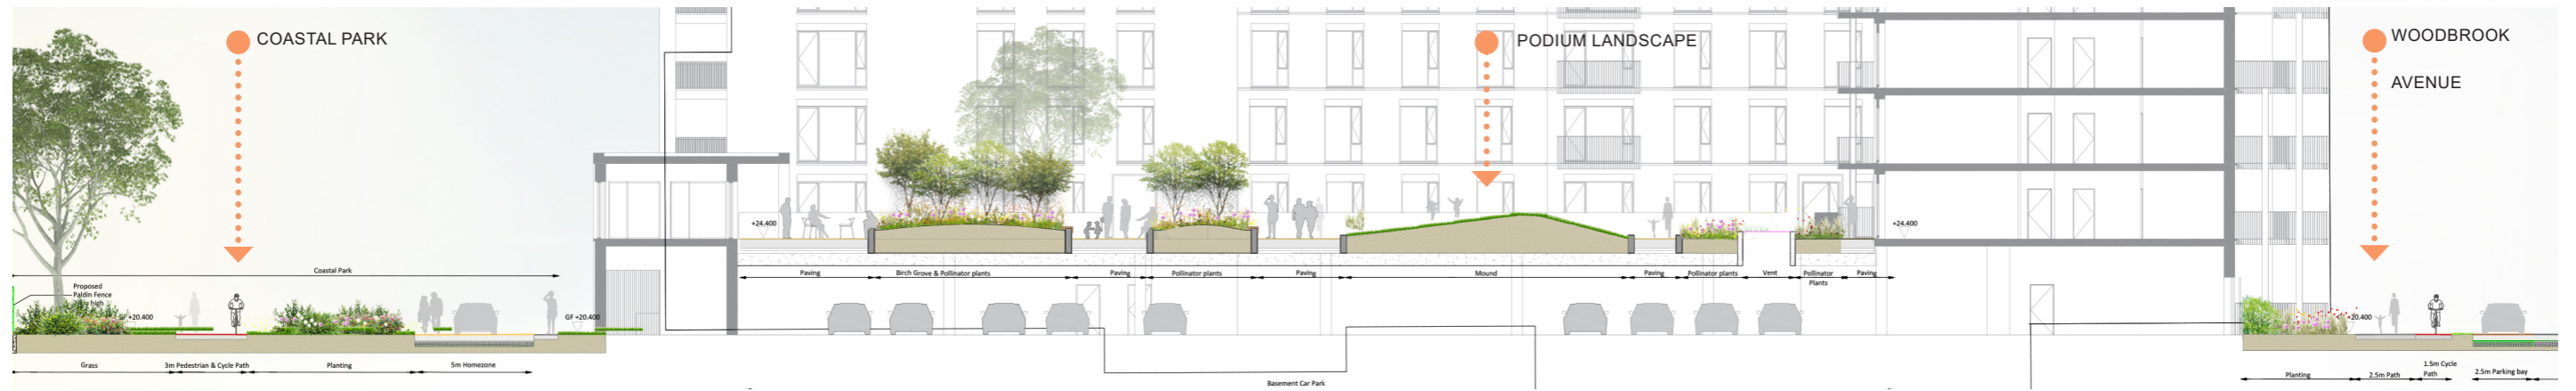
Cross Section through Block B and Coastal Park and Woodbrook Avenue
